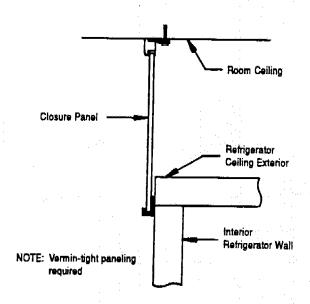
Enclosure of Space Between Top of Walk-in and the Ceiling
